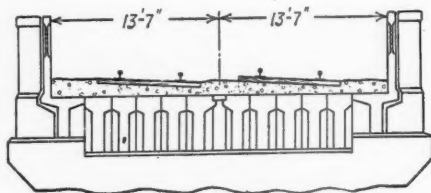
Cross section of bridge deck, showing typical construction with precast units of the T-beam type
